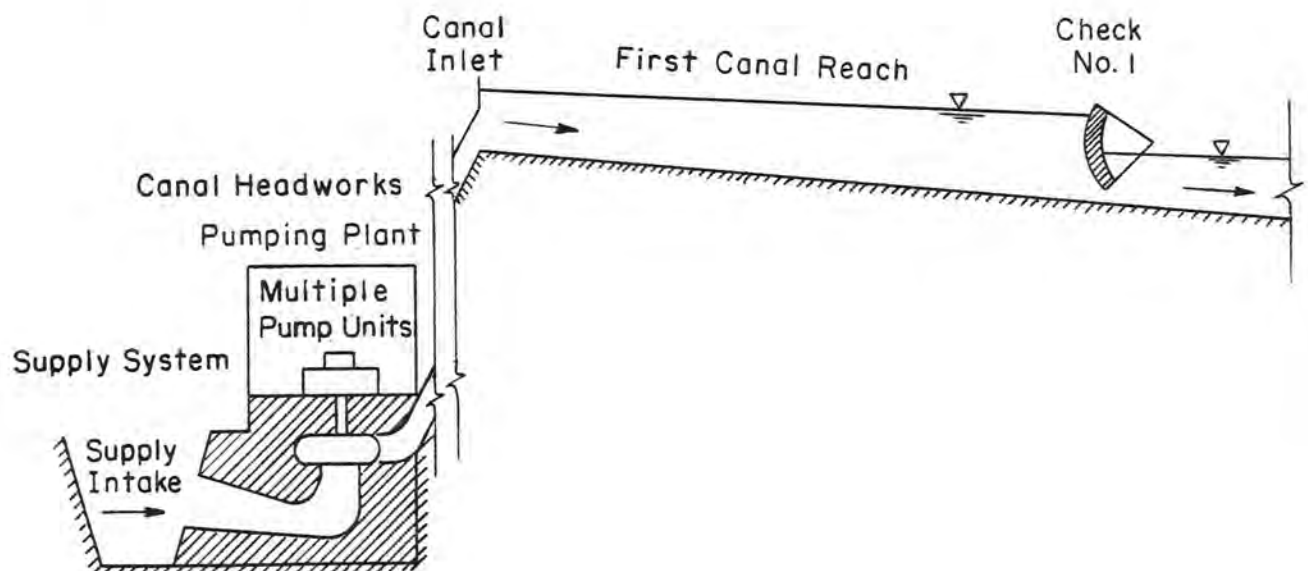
SCHEMATIC PROFILE OF CANAL HEADWORKS PUMPING PLANT AND FIRST CANAL REACH DOWNSTREAM
